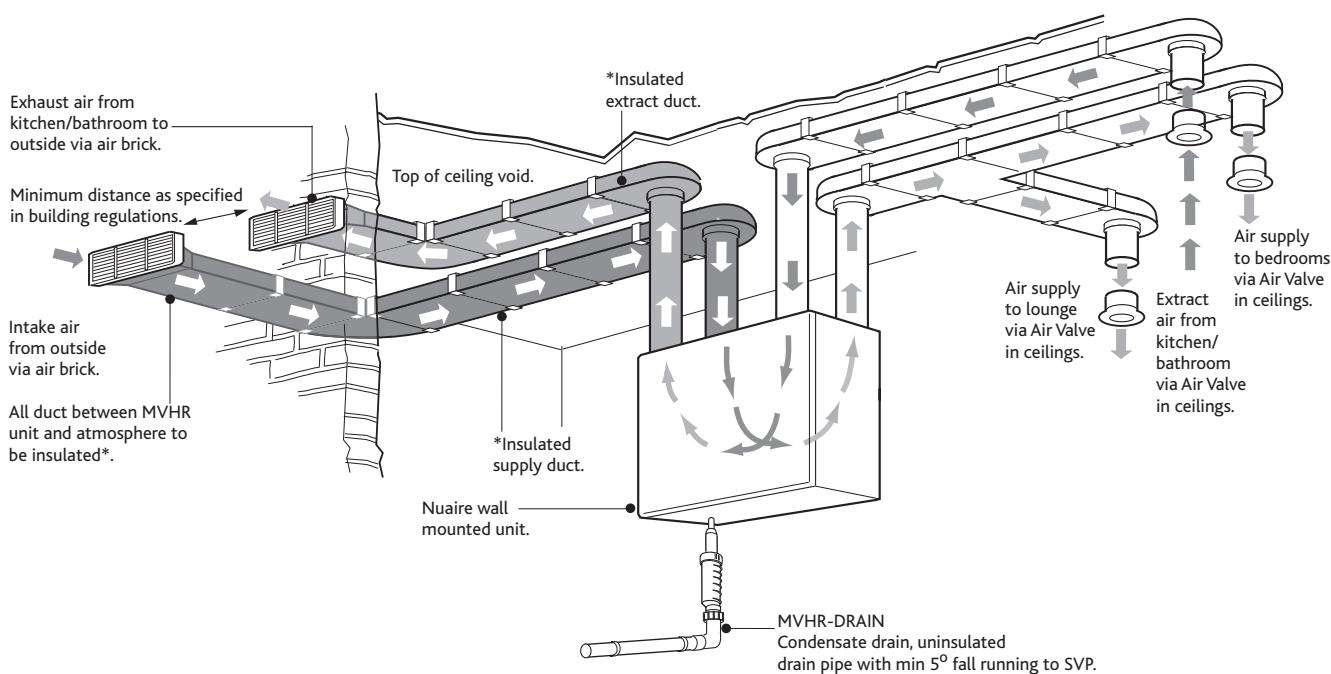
Typical ducted arrangement for a wall mounted unit using rectangular ducting.
